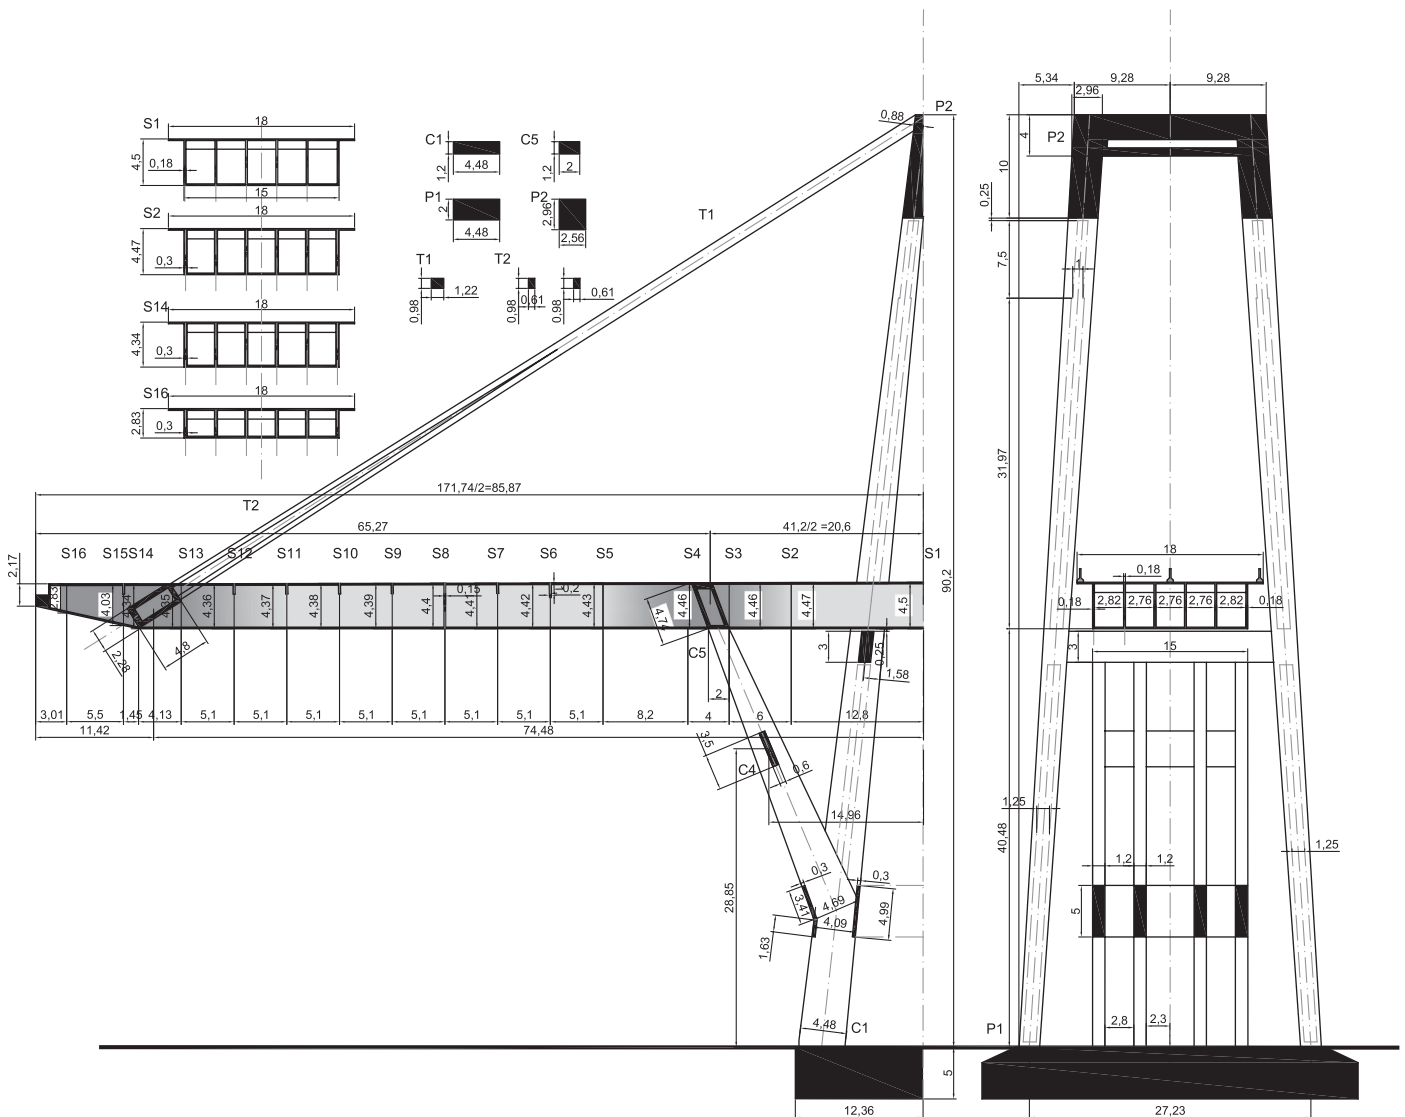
Longitudinal and transversal section of one of the "balanced systems" that constituted the large span portions of the viaduct (Units: m)
